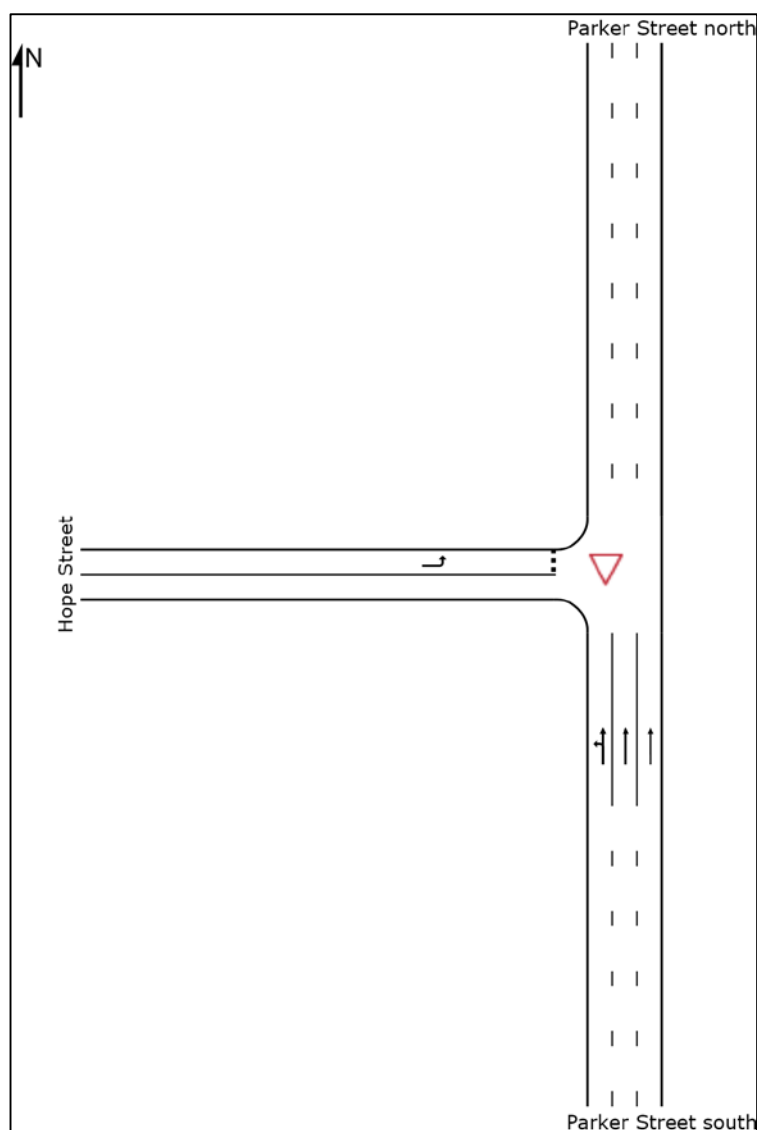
Priority-controlled Intersection Layout of Parker Street with Hope Street (SIDRA)
